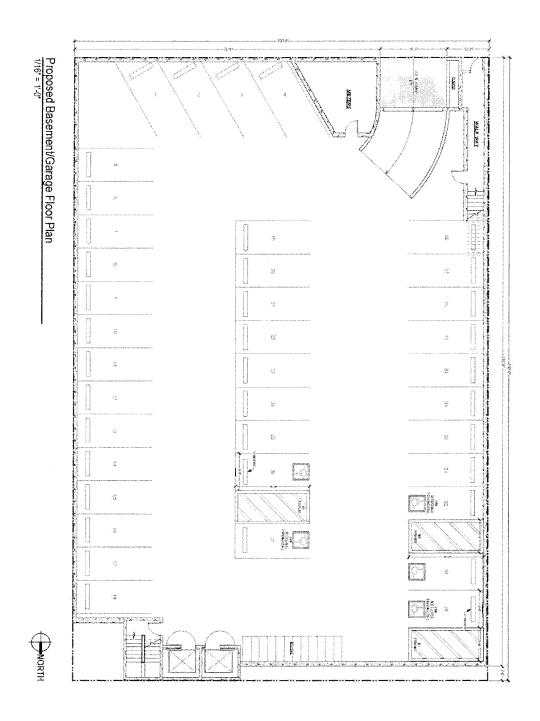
Basement Floor Plan 480 Potrero Avenue
